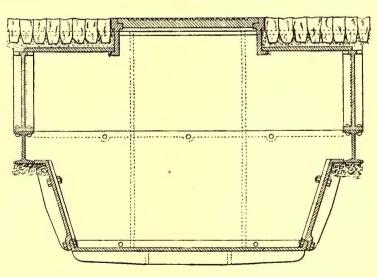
LONGITUDINAL SECTION OF PULLEY VAULT,
